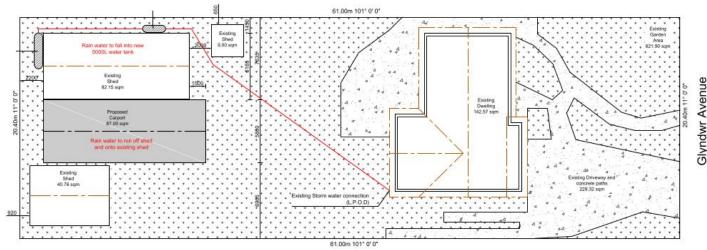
Site Plan: 13 Glyndwr Avenue, Oberon
